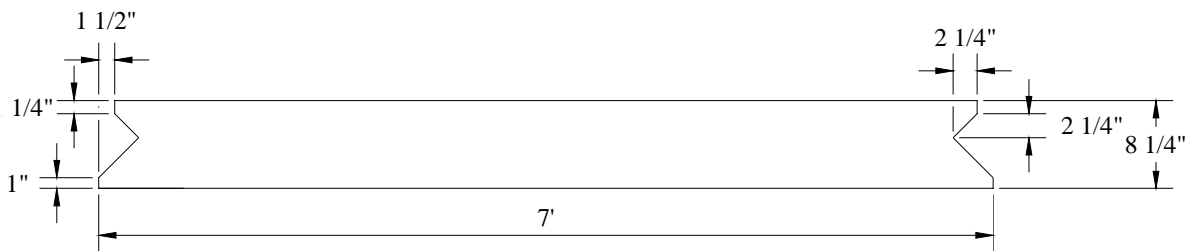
Full-depth precast concrete deck panel (courtesy of Iowa DOT).
